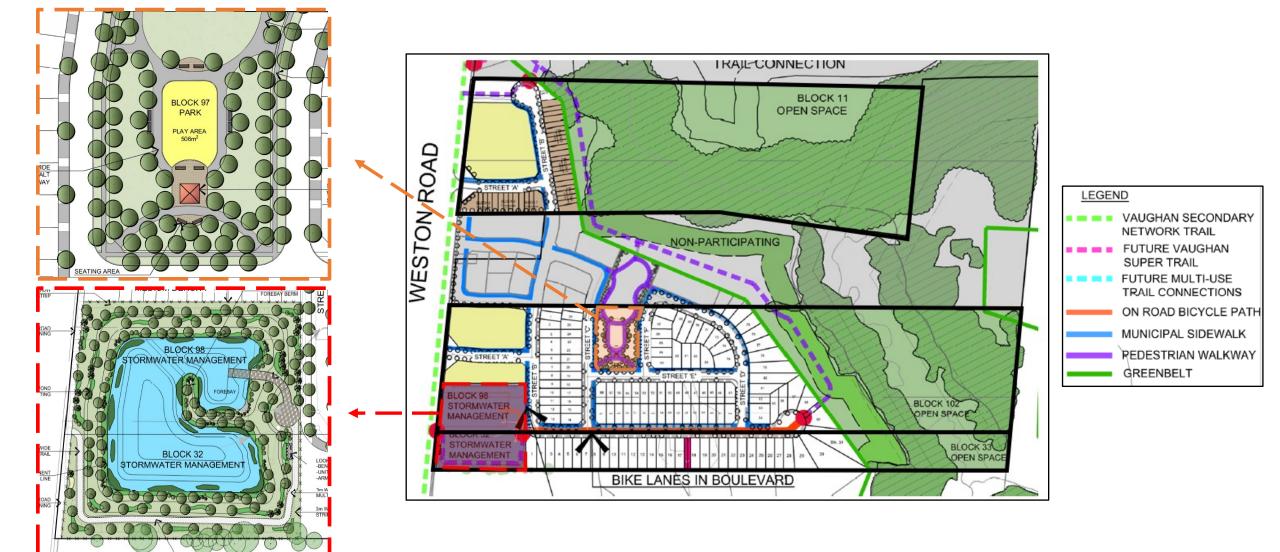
Related Draft Plan of Subdivision Application (19T-220V13) – Edenbrook (Weston) Inc.
